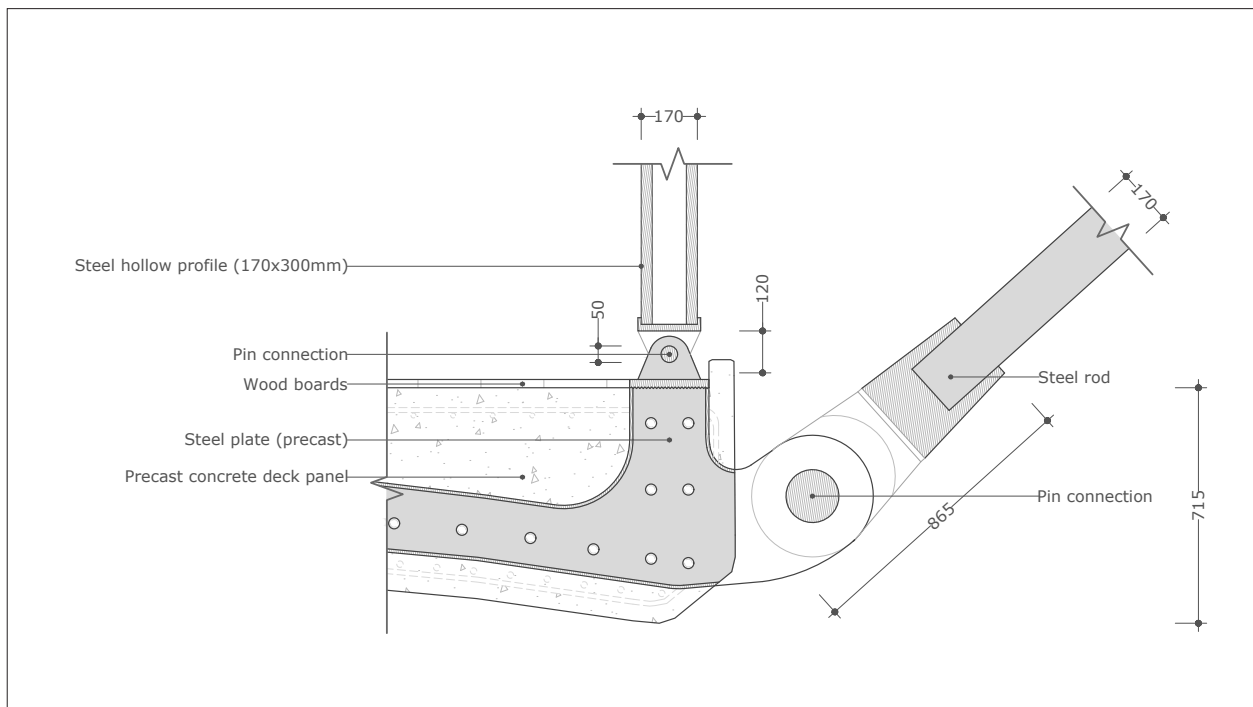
Vertical support and steel rod anchorage to the footbridge
